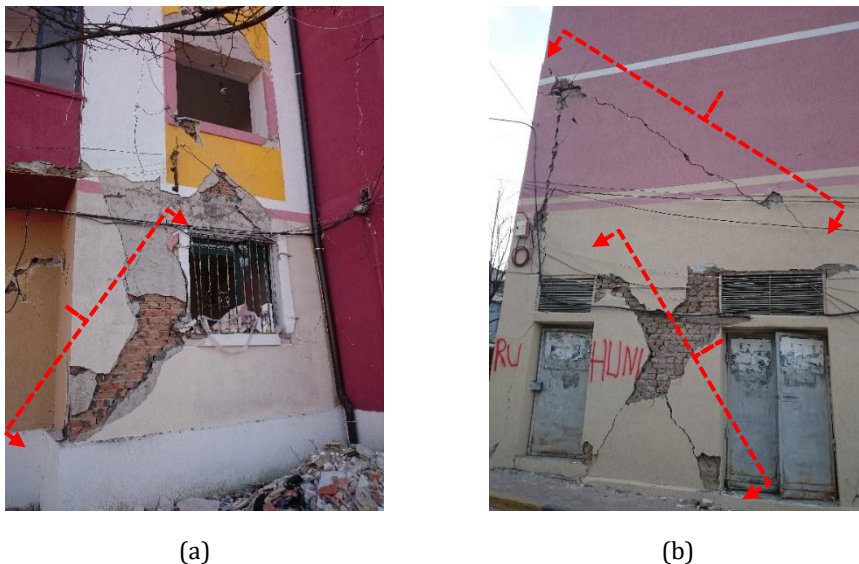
Heavy shear cracks on load bearing walls of the two multi-story masonry buildings
